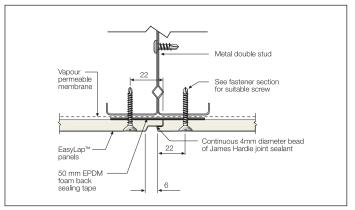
SHEET JOINT ON STEEL - FLUSH SCREW OPTION
